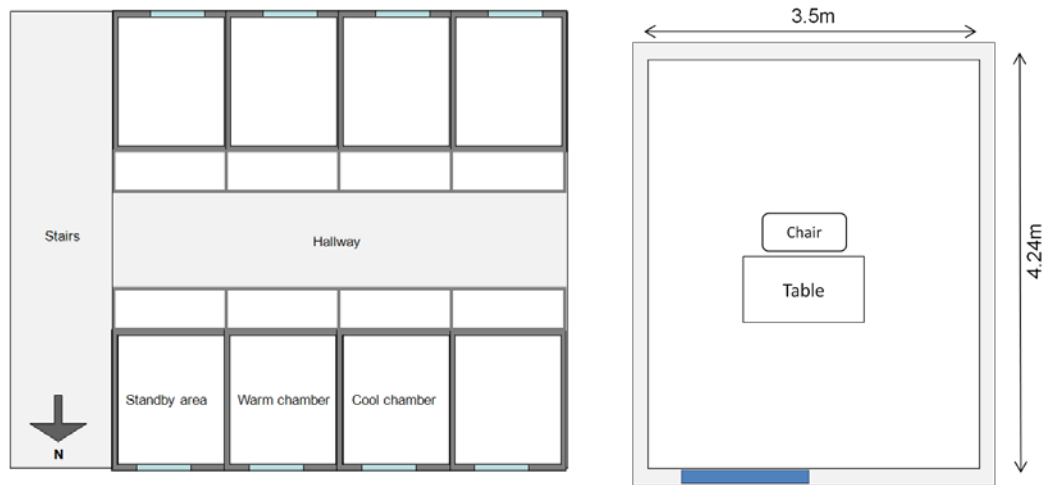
Floor plans of the selected building facility (left) and the environmental chambers
